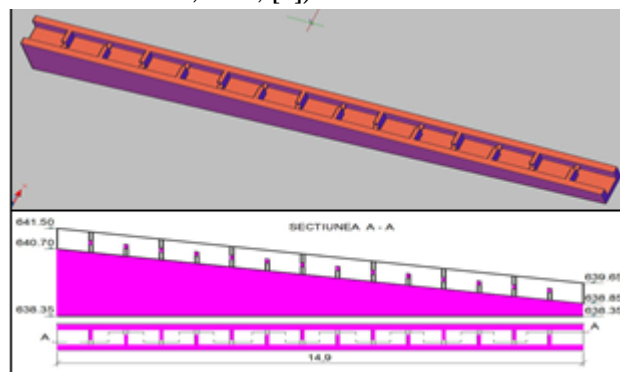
Fish ladder structure - overall 3D view, longitudinal crossview, planview
